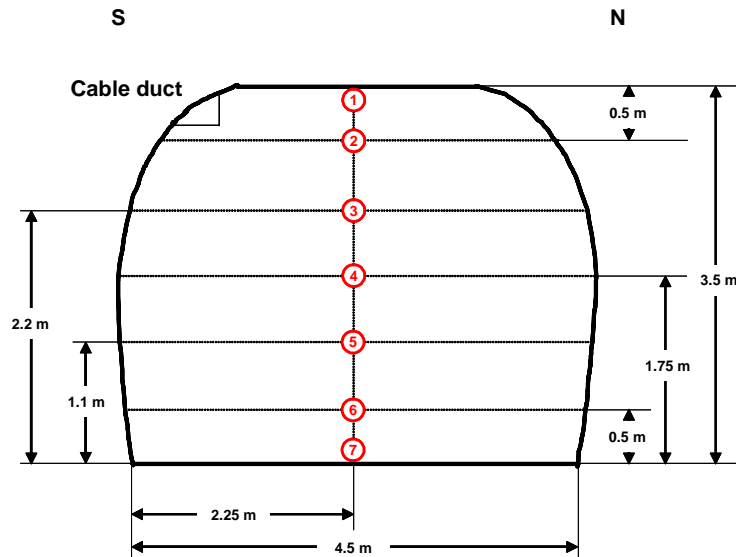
Backfill sampling locations (samples 1 to 7) for porosity and permeability measurements in cross section E1
